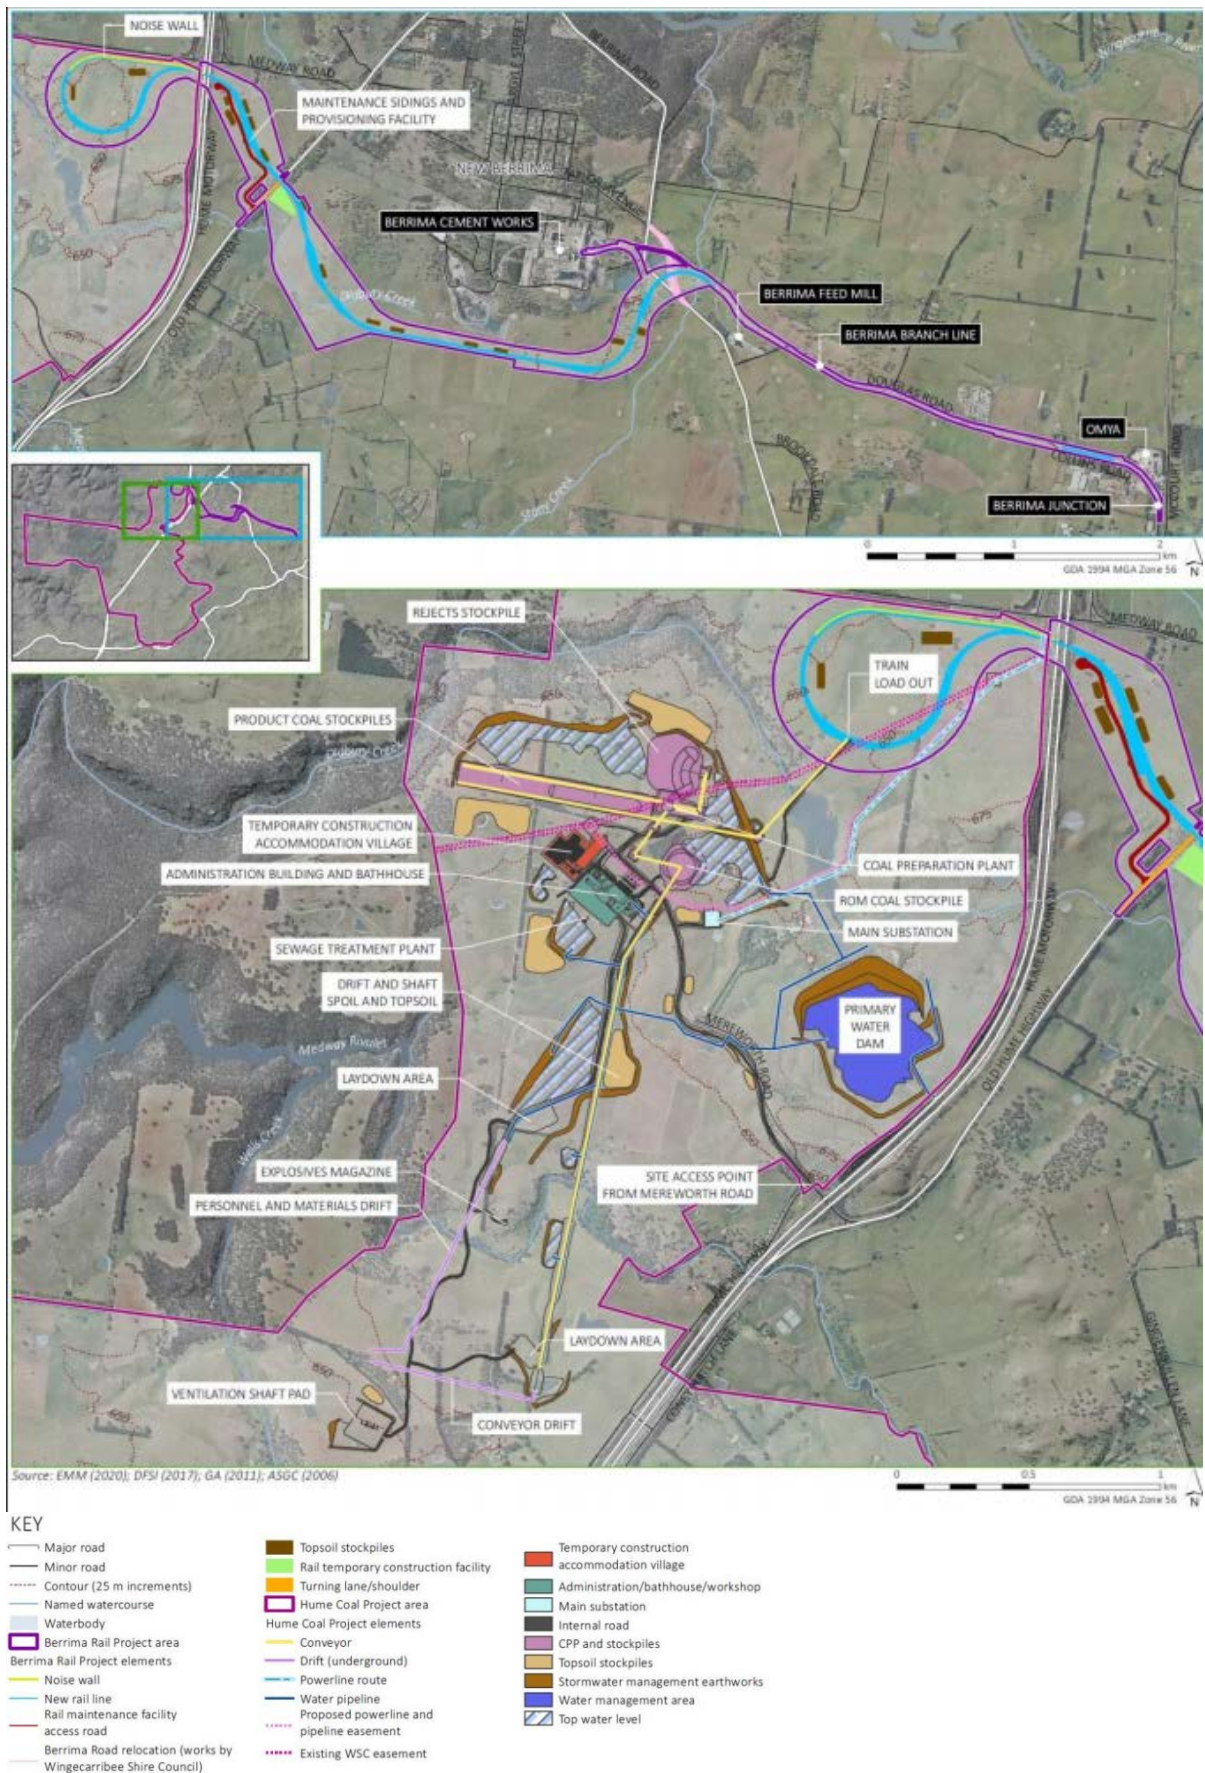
Surface Infrastructure – Hume Coal Project Berrima Rail Project Layout (source: Department's FAR)
